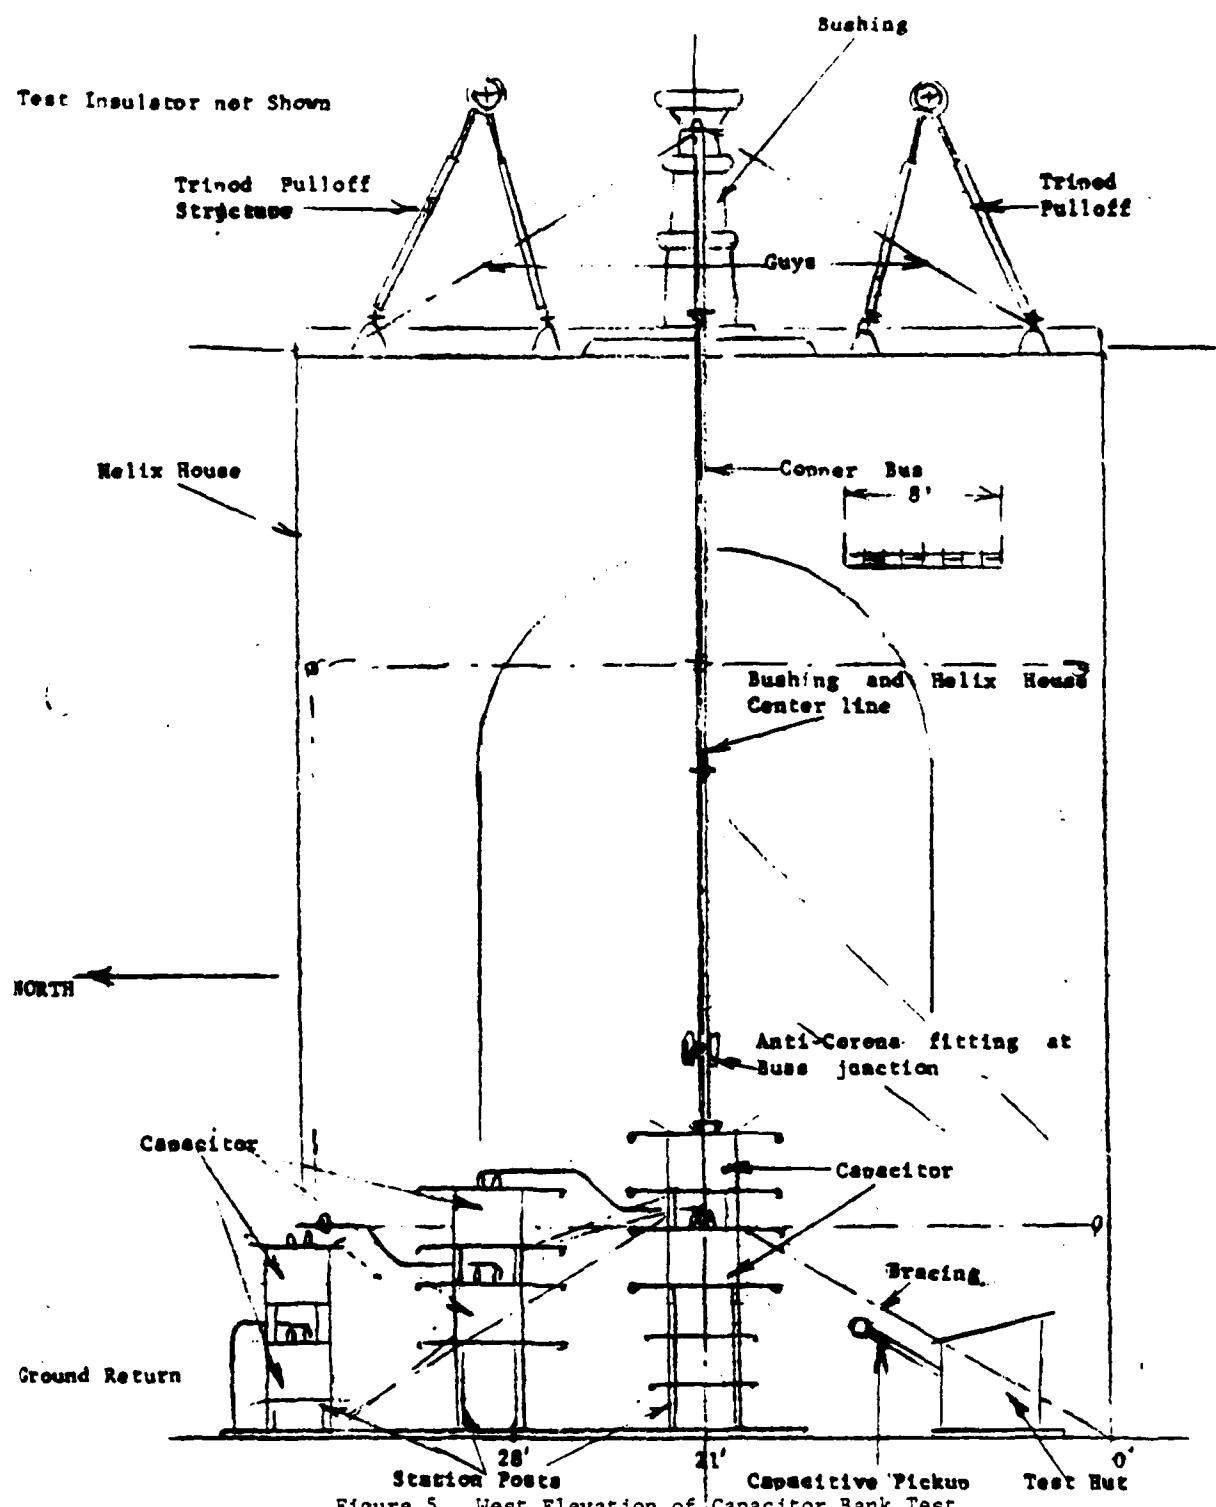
West Elevation of Capacitor Bank Test Facility at Luaualei
